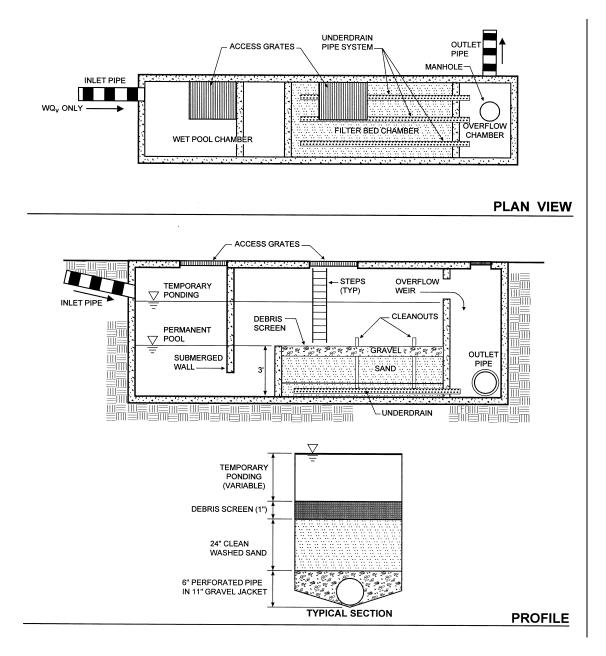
Schematic of Underground Sand Filter (Source: Center for Watershed Protection).
